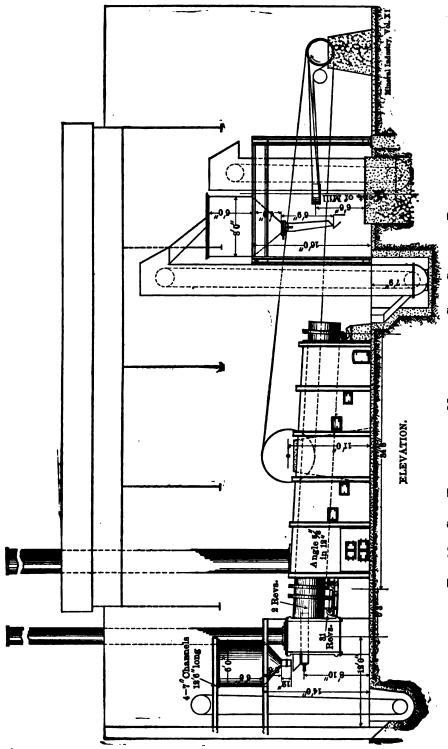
Side Elevation of Machinery in Coal Grinding Building.
